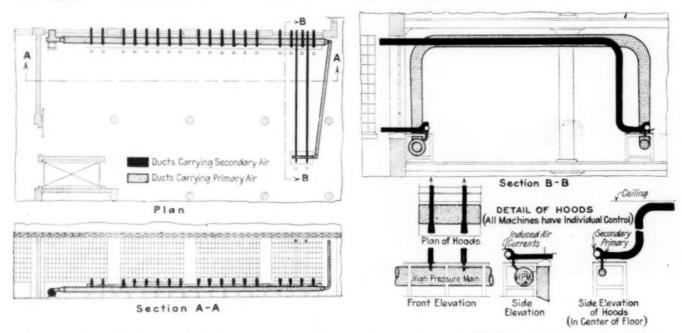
PLAN, ELEVATION AND SECTIONS OF NEW SATIN-FINISHING DEPARTMENT, SHOWING THE PRIMARY AND SECONDARY AIR DUCTS
